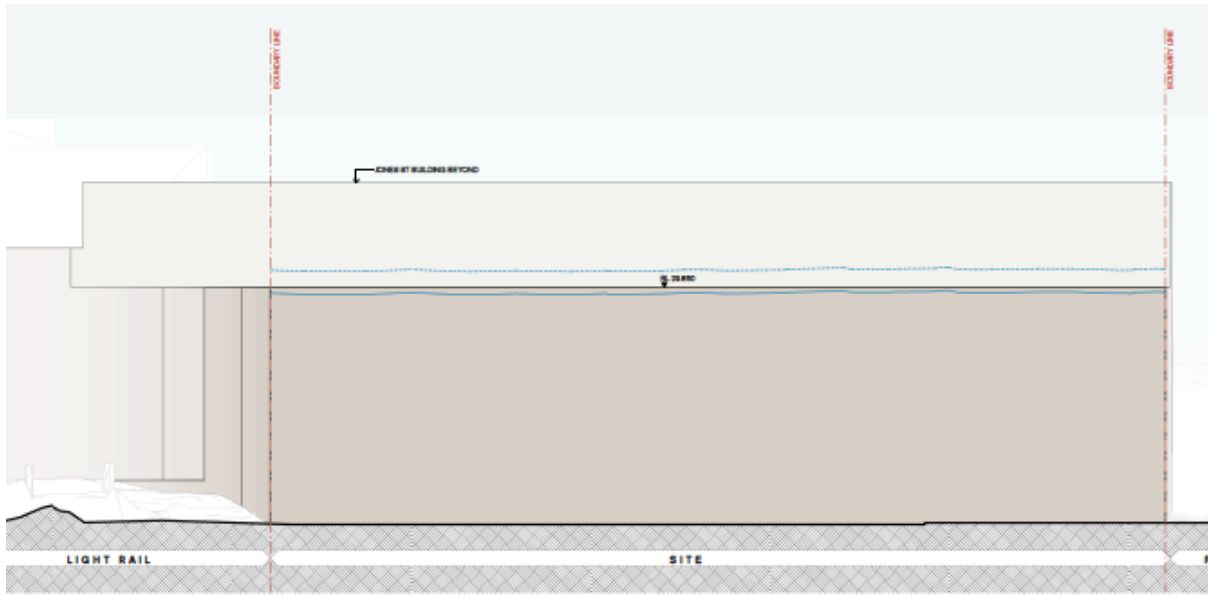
Location and Extent of competitive process – Elevation Wattle Street
